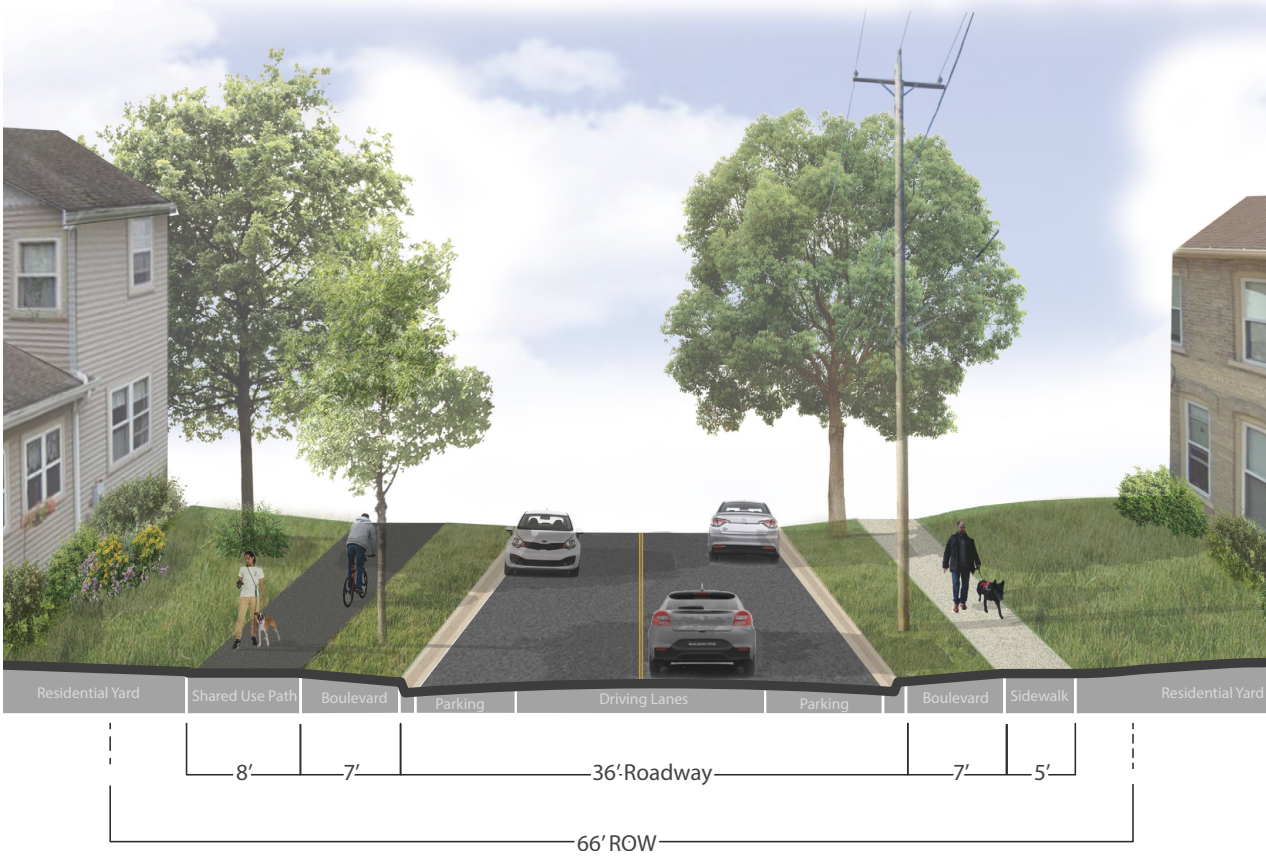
Cross section and plan view study of a shared use path along Fourth St.
